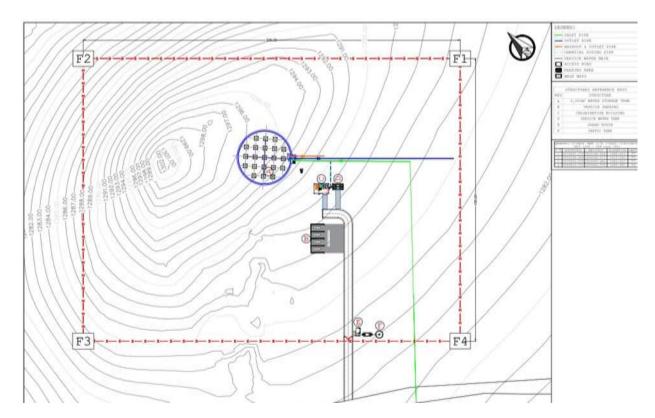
Zamahero Storage Tank - Site Layout of 1,000 m3 Reservoir
